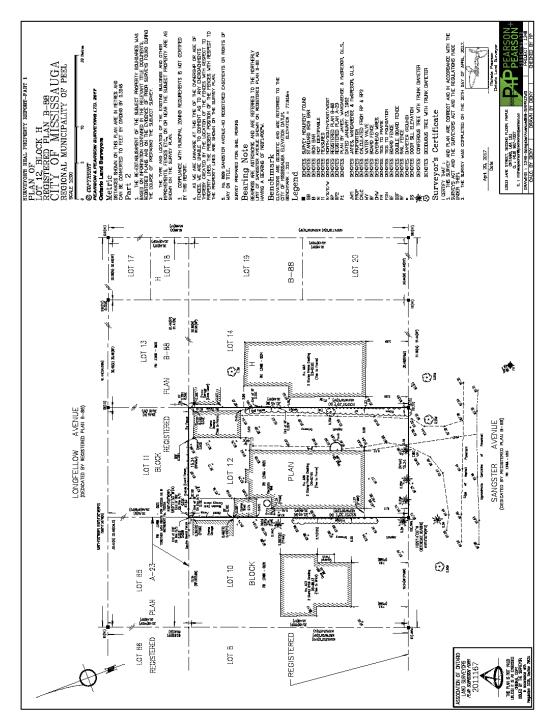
Survey of lot 12, block H, Plan B88, 869 Sangster Avenue. (Image from owners.)
